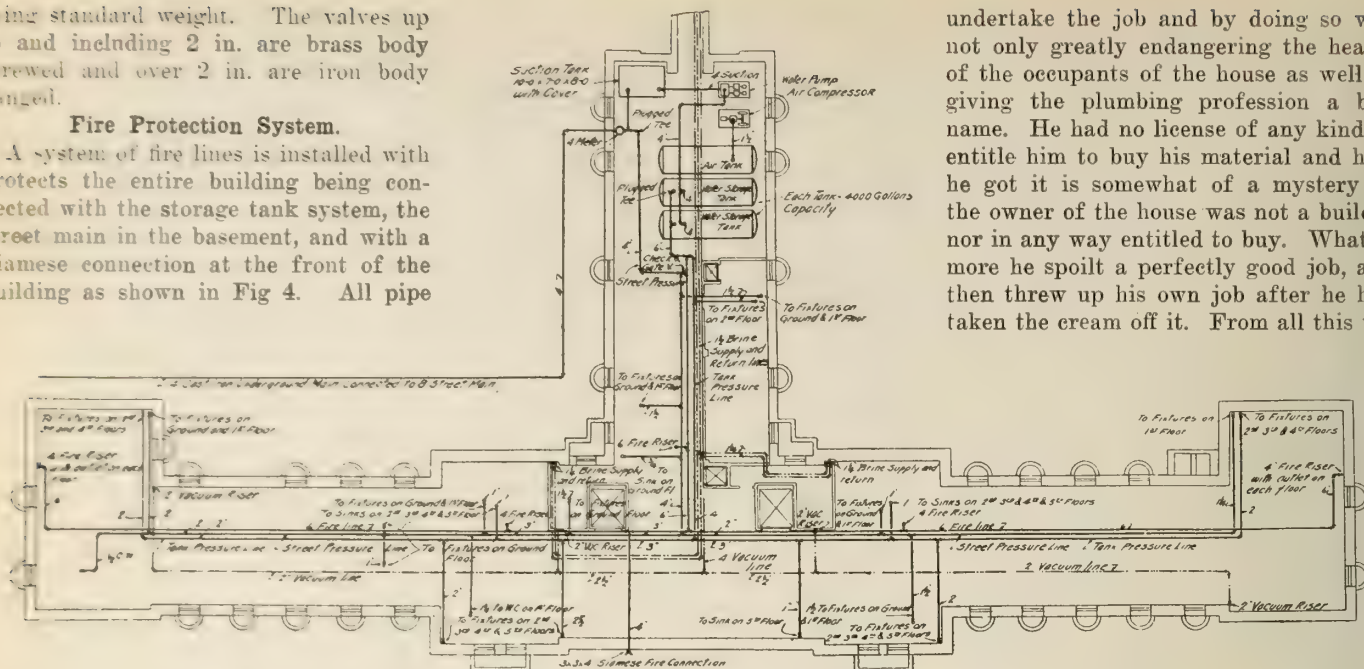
Basement Plan of Water, Fire, Brine and Vacuum Piping.
